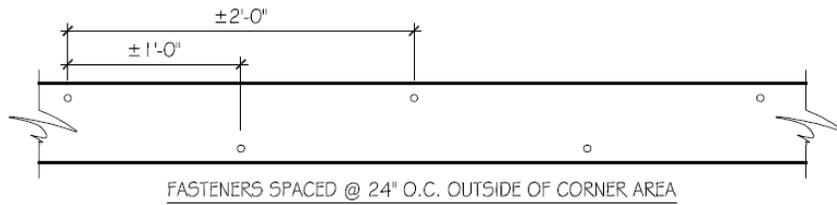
B - TYPICAL ROOF EDGE WOOD BLOCKING - SCREW FASTENER ANCHORAGE
